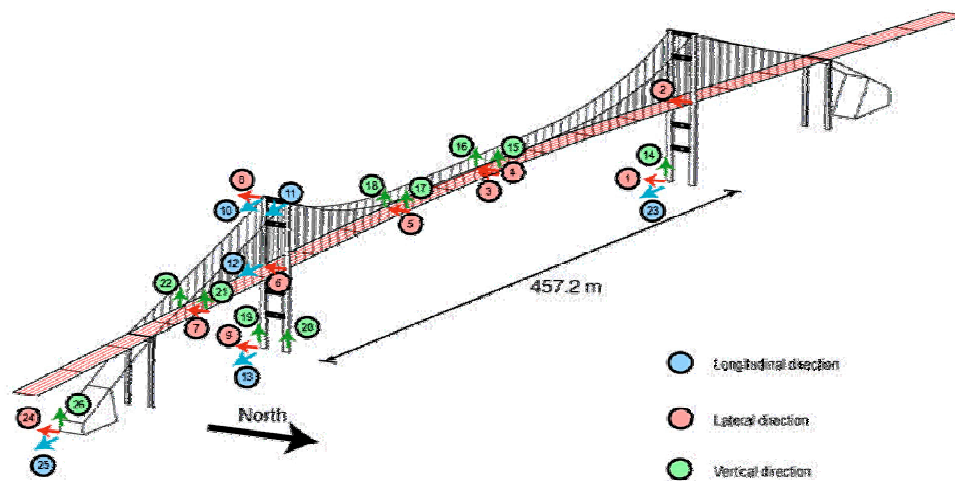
SENSOR LAYOUT ON THE VINCENT THOMAS BRIDGE
